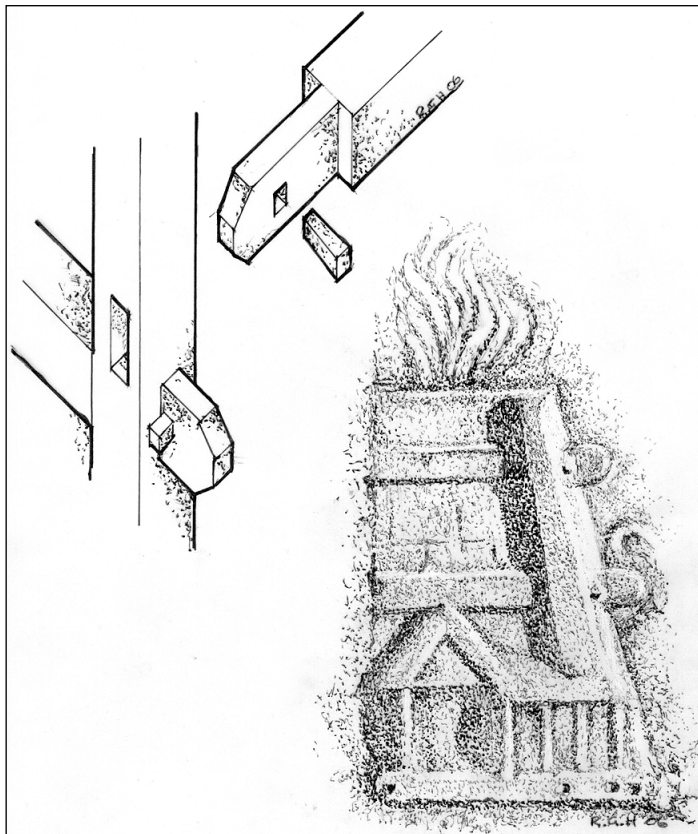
Diagram of tusk tenon joints, with sketched detail of blast furnace from the Lenard fireback 1636
